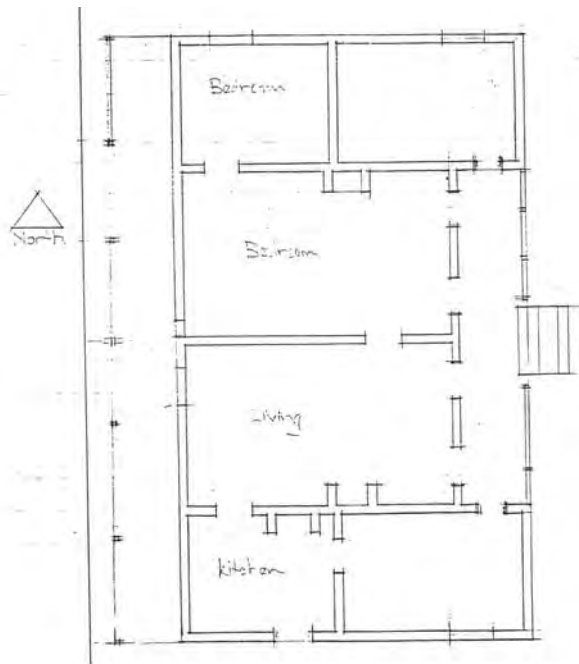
Comberton Homestead floor layout sketch. (Source: McBean & Crisp Pty Limited report, 1990)
